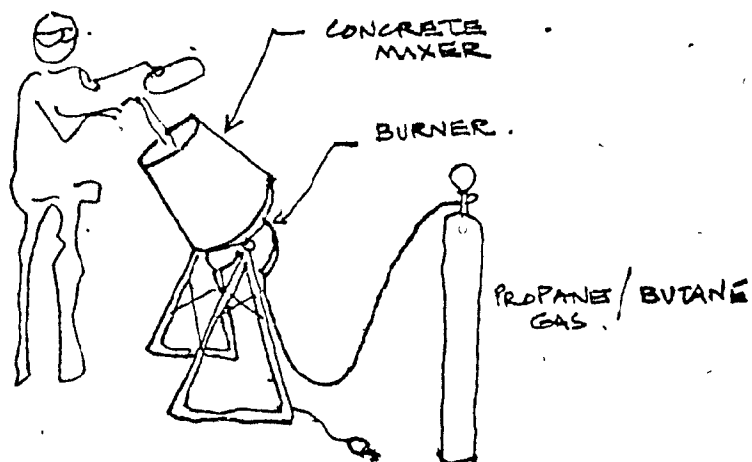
Mixing of sulfur concrete (MCHG)
